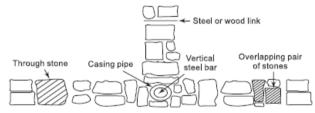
Vertical steel reinforcement in low-strength masonry walls (typical construction details for installing vertical steel bars in random-rubble stone masonry)
